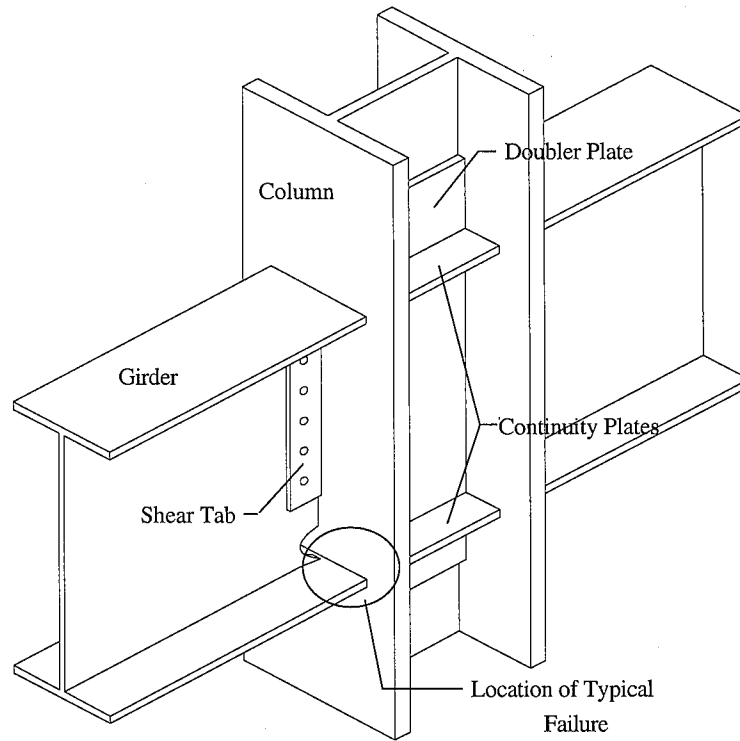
Typical Girder-to-Column Connection [after (Hajjar et al., 1995)]
